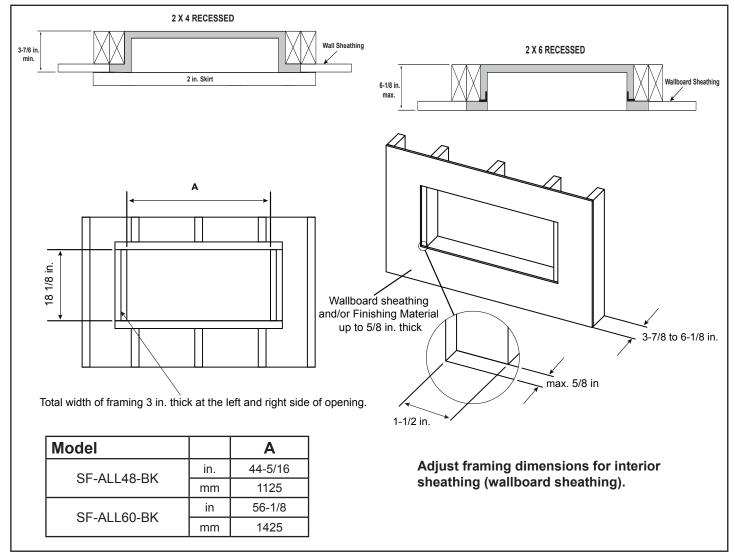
Framing and Wall Finishing for Recessed Installation
